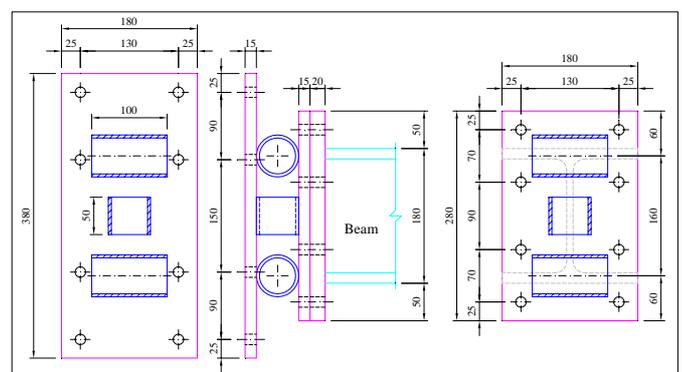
Details of the specimens HLT-C2 & HLT-C3 of KHONSAR™ connection.
